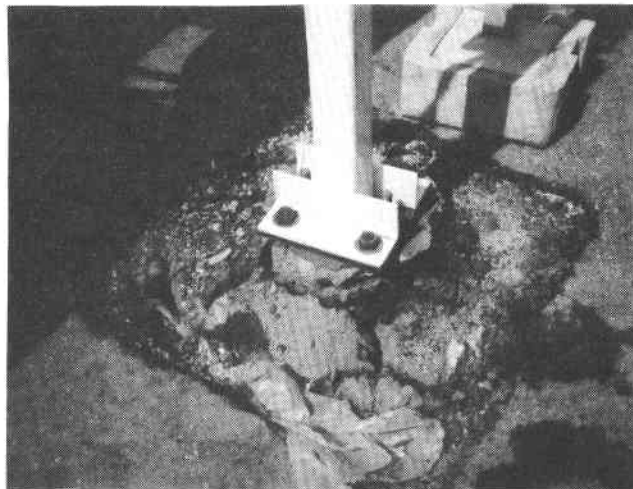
Standard Pedestal Test Frame Installed on Pier # 1
